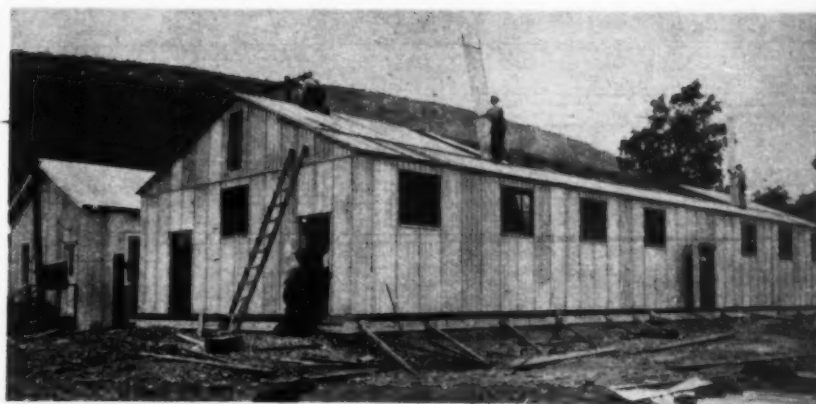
11 A.M., THIRD DAY—While roofing is being completed workers have installed steel sash in window openings.
